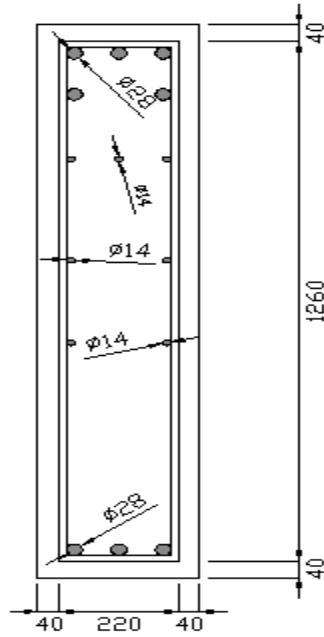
Typical Cross Section of 30/138 Beams at Supports
